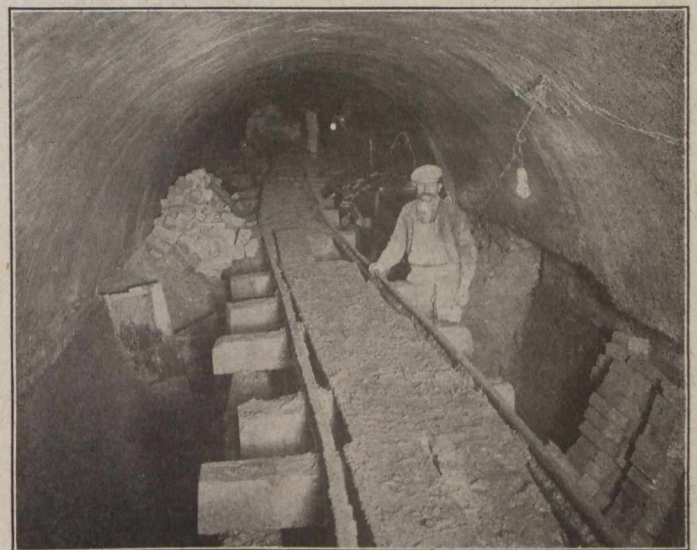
Tunnel Part of Section 4, Showing Method of Excavating and Underpinning.
